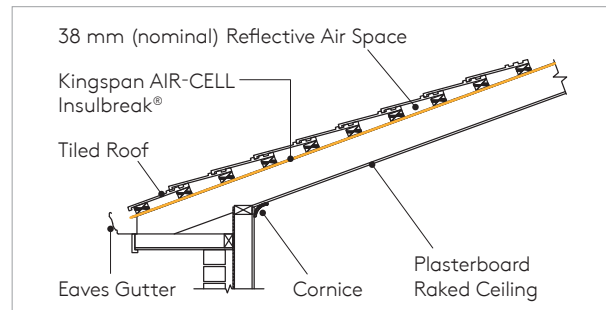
Side elevation of Kingspan AIR-CELL Insulbreak® 55 in a timber framed tiled roof with a raked ceiling.
